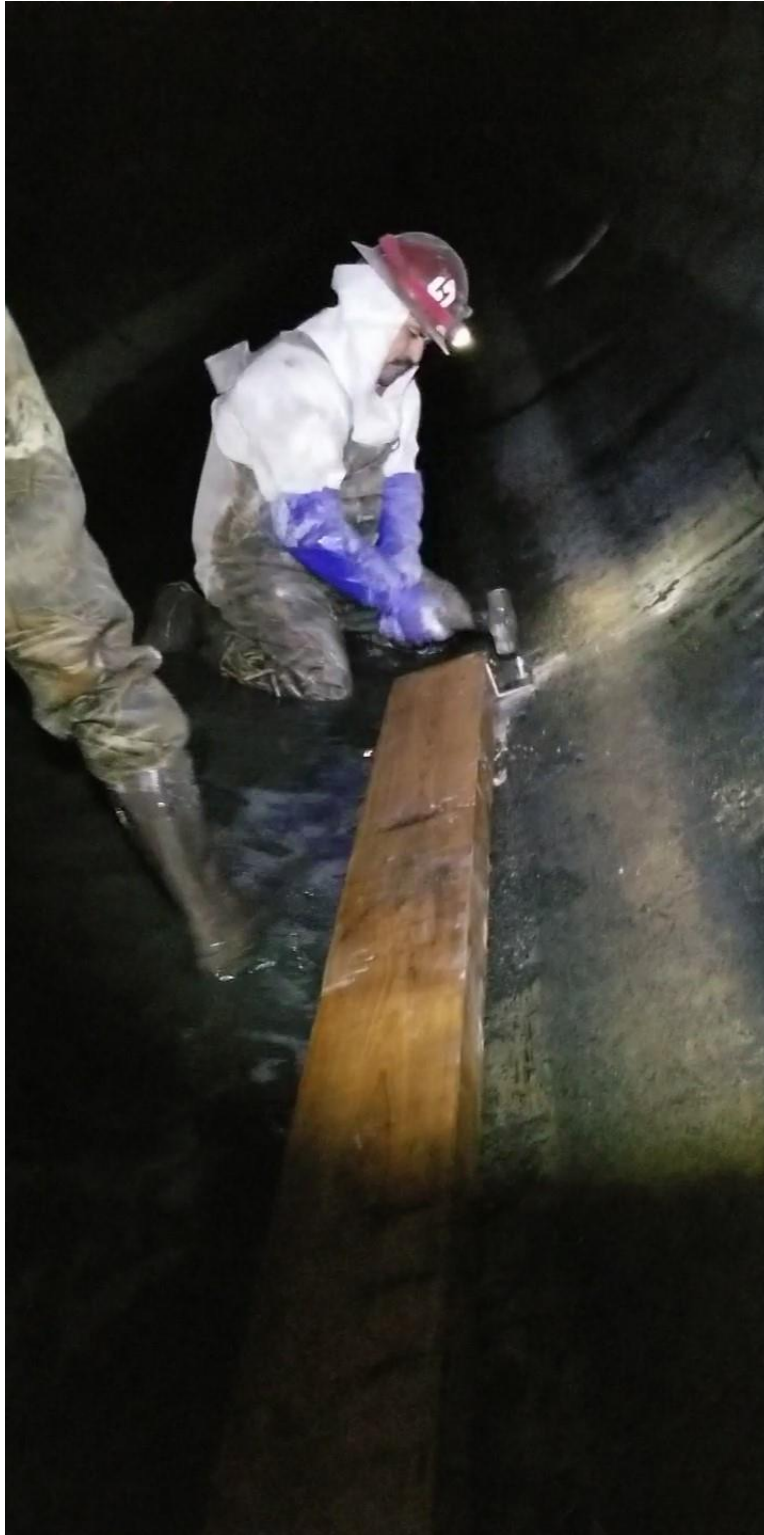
Installation of Wood Blocking on the Pipe Invert
